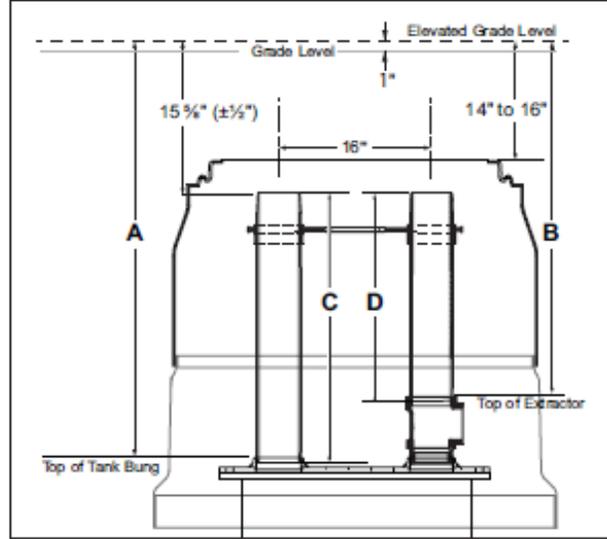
Installation without M/F 4x4 riser Adapters NPT (Taper Thread) Buckets
